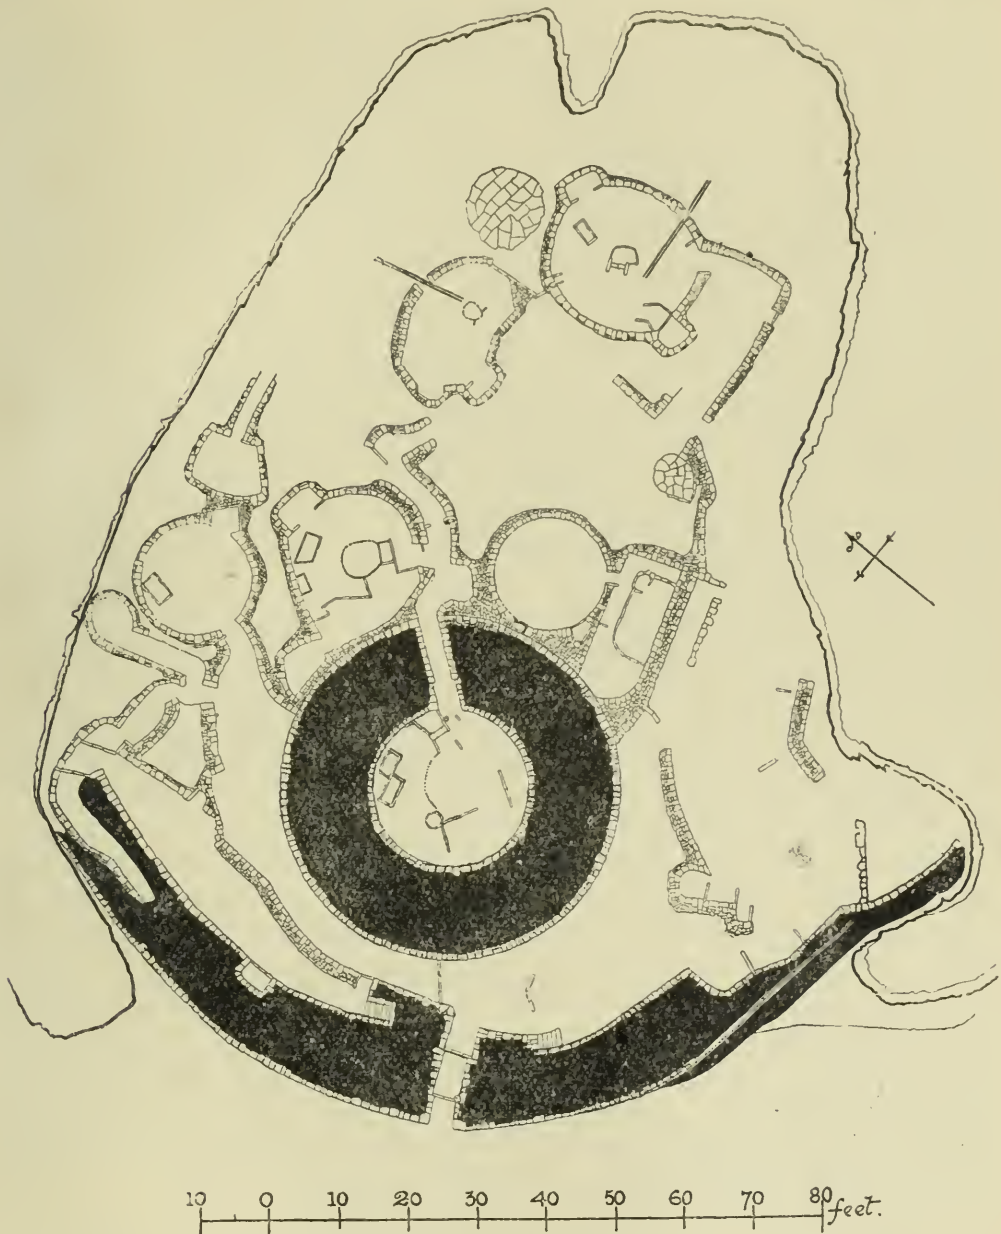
Broch, Nybster (No. 518); Ground-plan.
